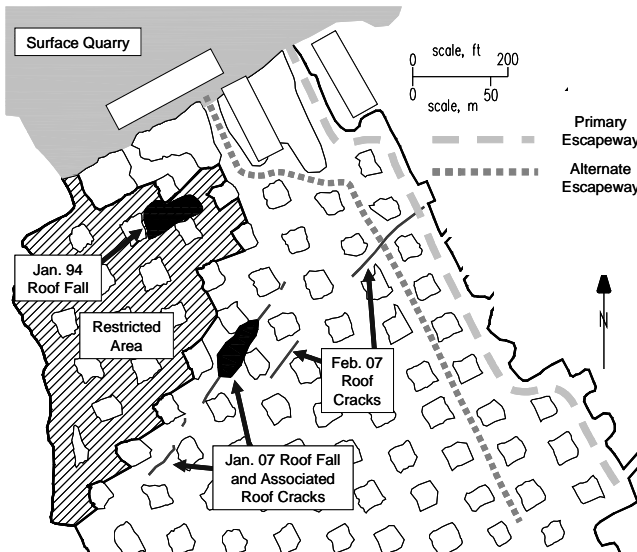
Escapeways, roof falls and recent roof cracks found at the mine.
